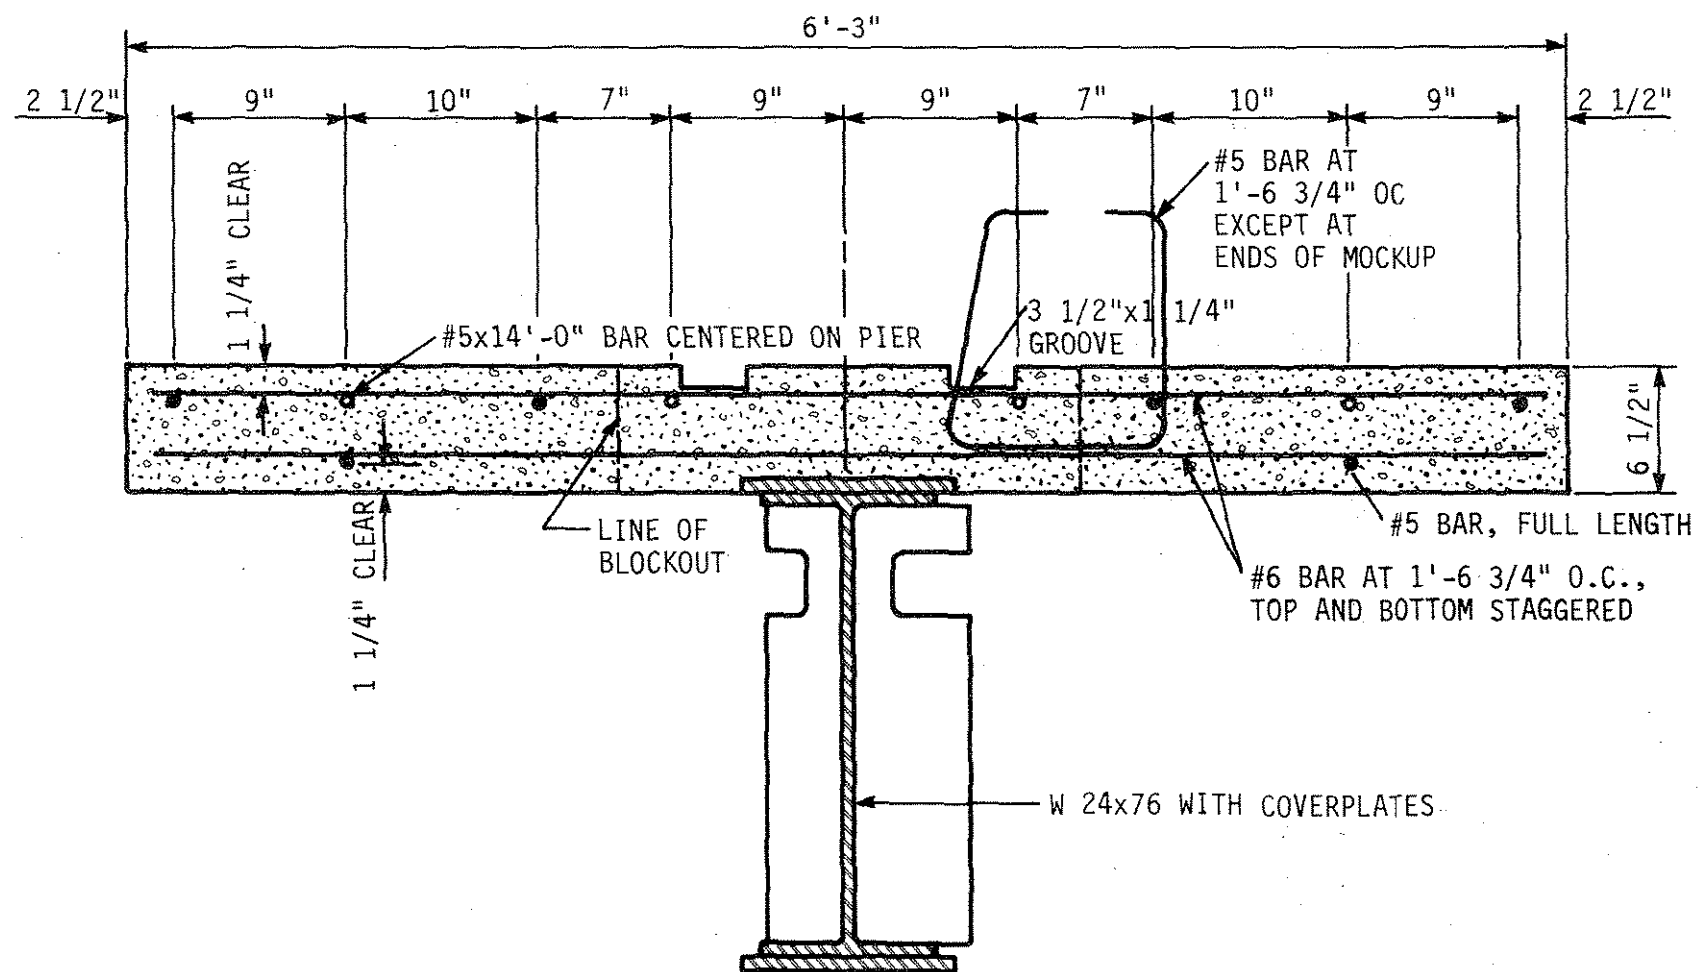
Composite beam, Section B-B. (see Fig. B.6.)
